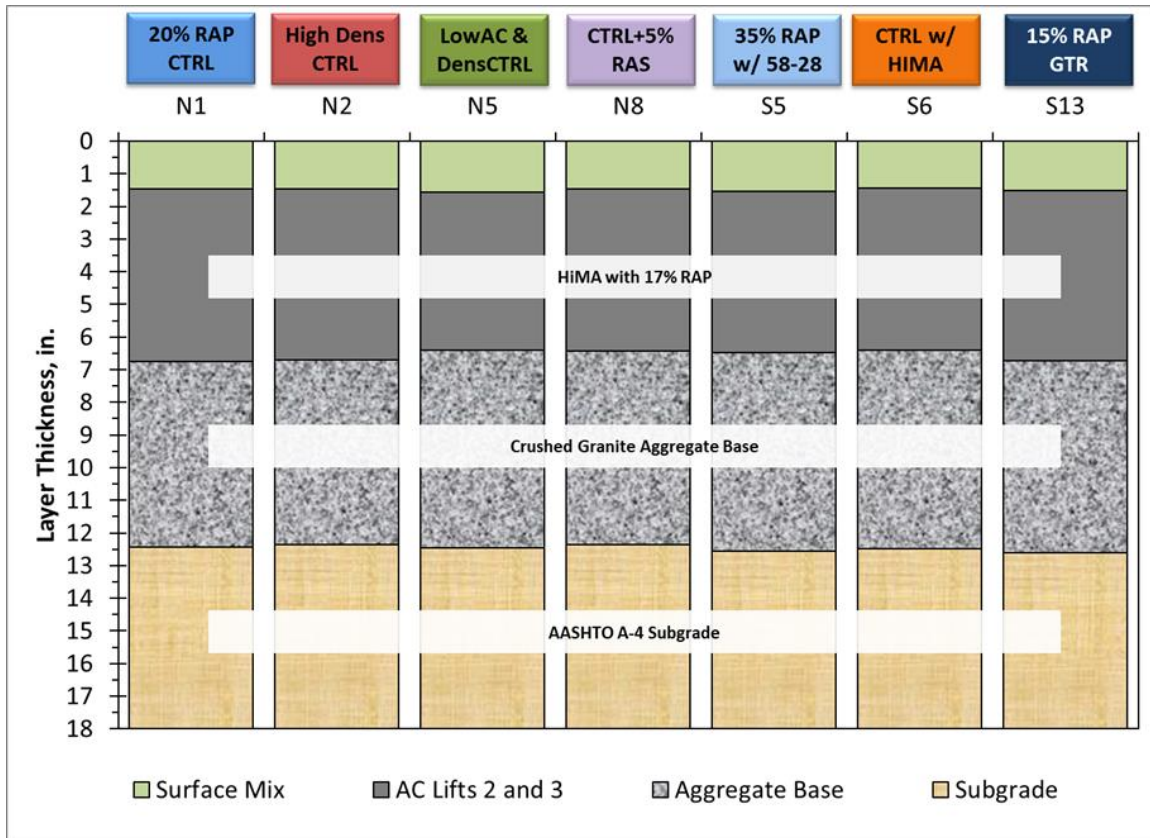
Cross-section of Cracking Group Test Sections on the NCAT Test Track
